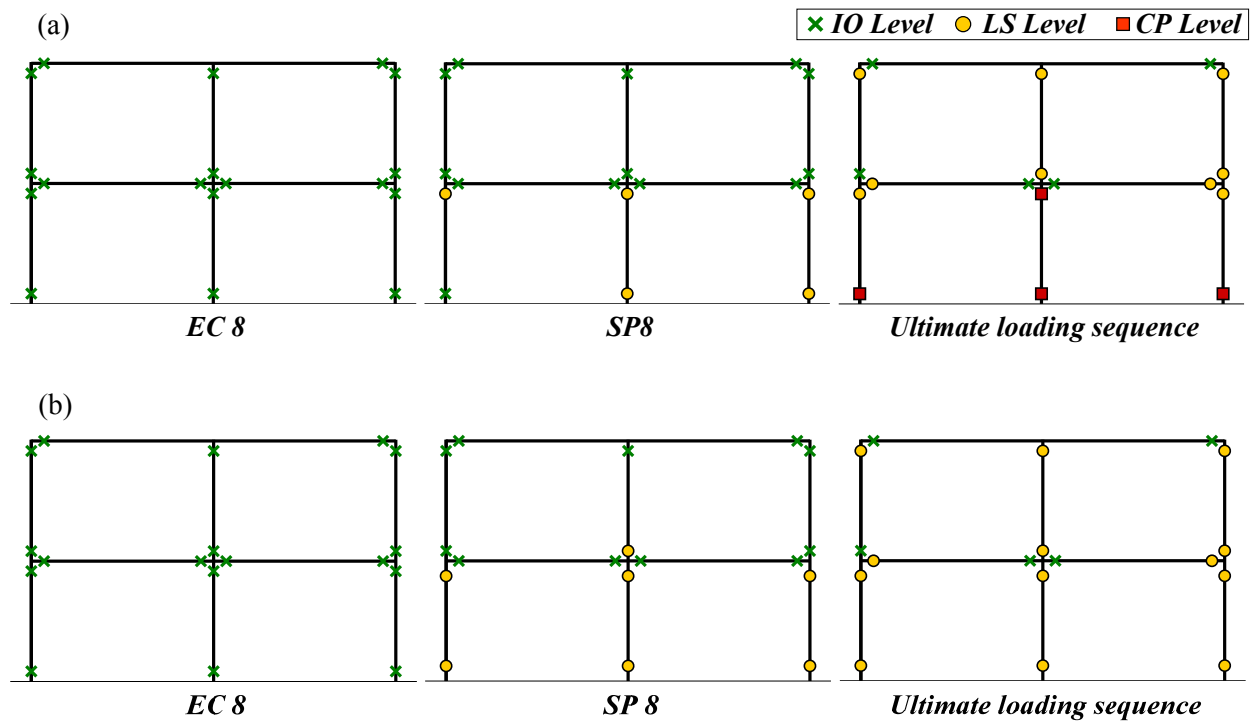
Damage sequence: (a) as-built test frame; (b) retrofitted test frame
